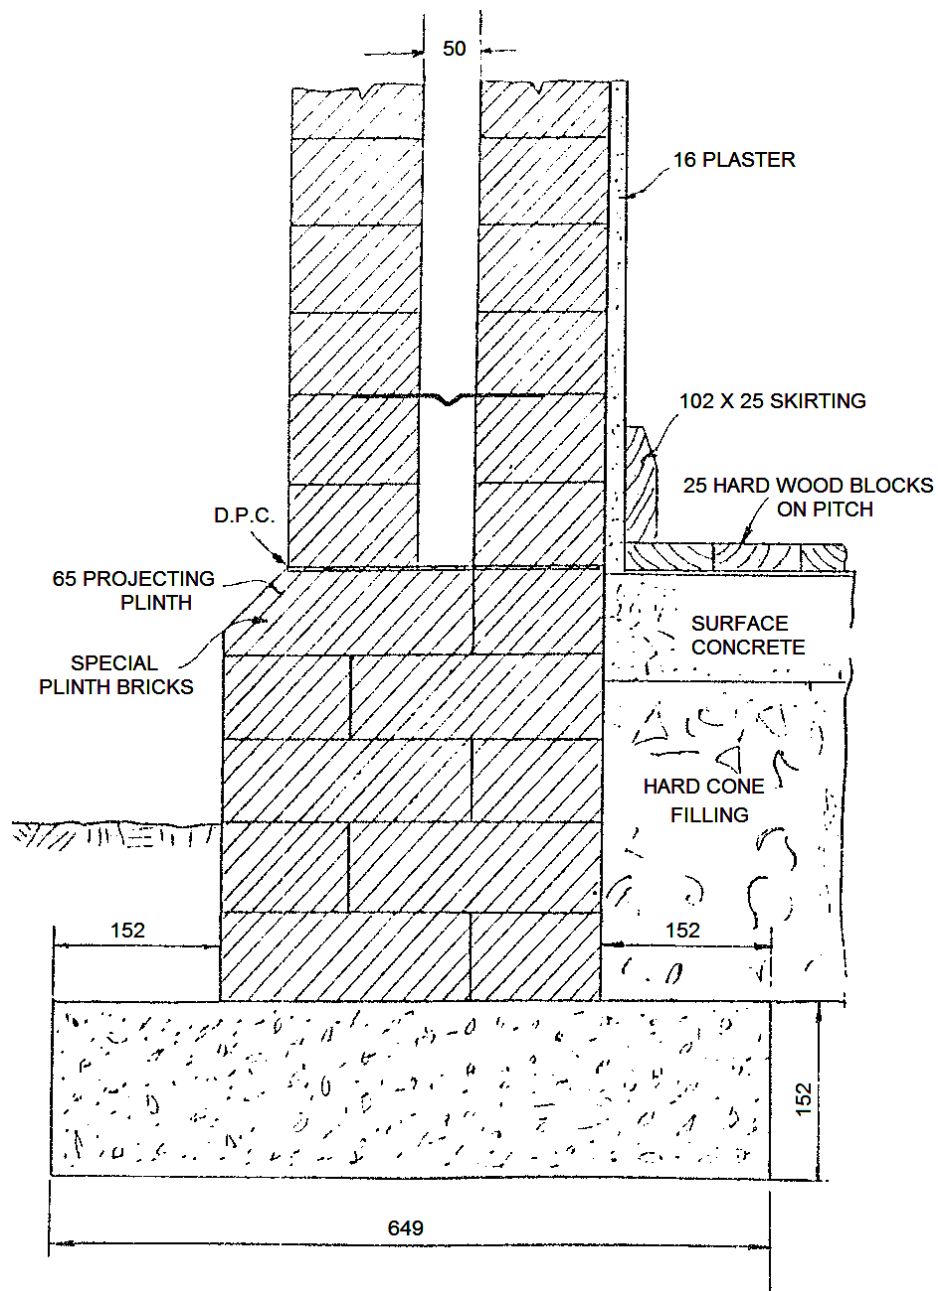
Section through 280 mm cavity wall showing typical South African foundation procedure
